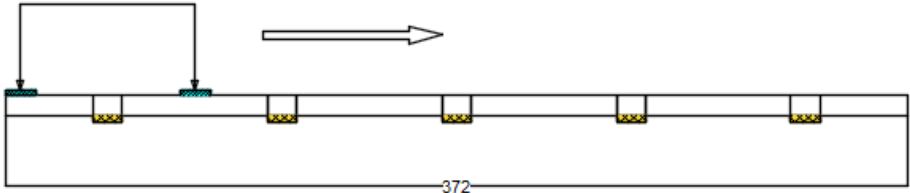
The placement of HL-93 load on the deck slab with 6 ft girder spacing (first combination)
